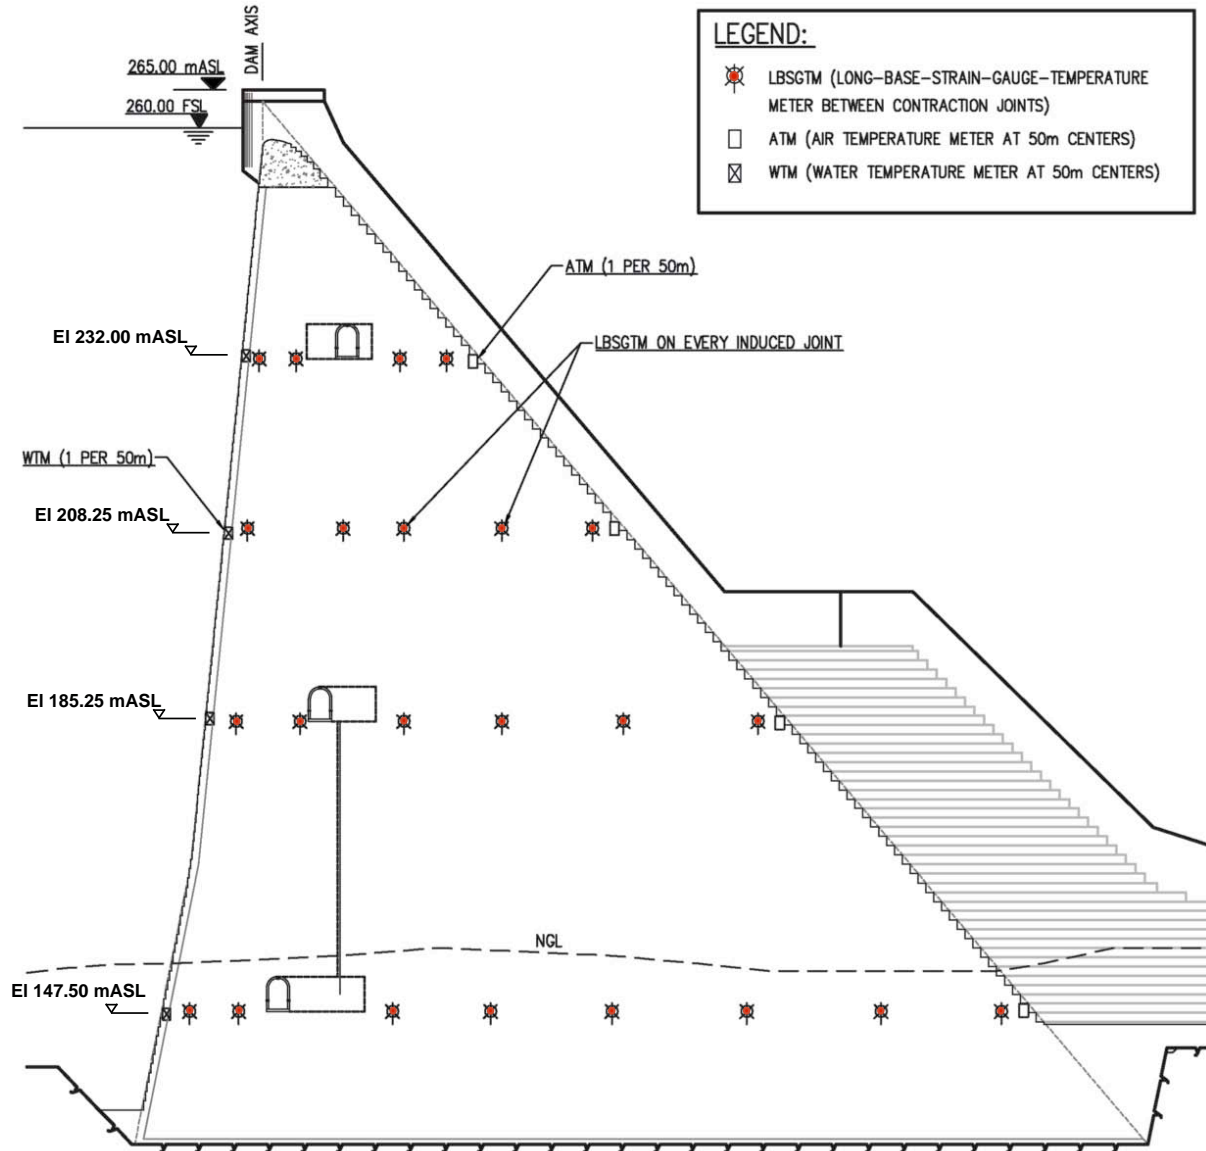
Typical Instrumentation Installed in Çine Dam⁽¹¹⁾
